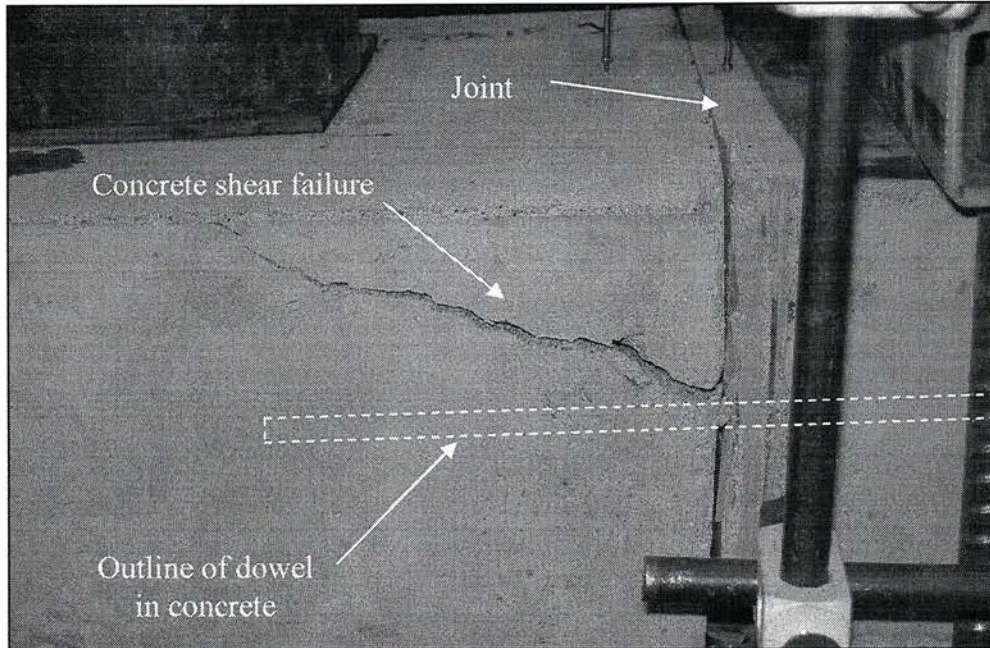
Typical concrete failure (rectangular plate specimen)
